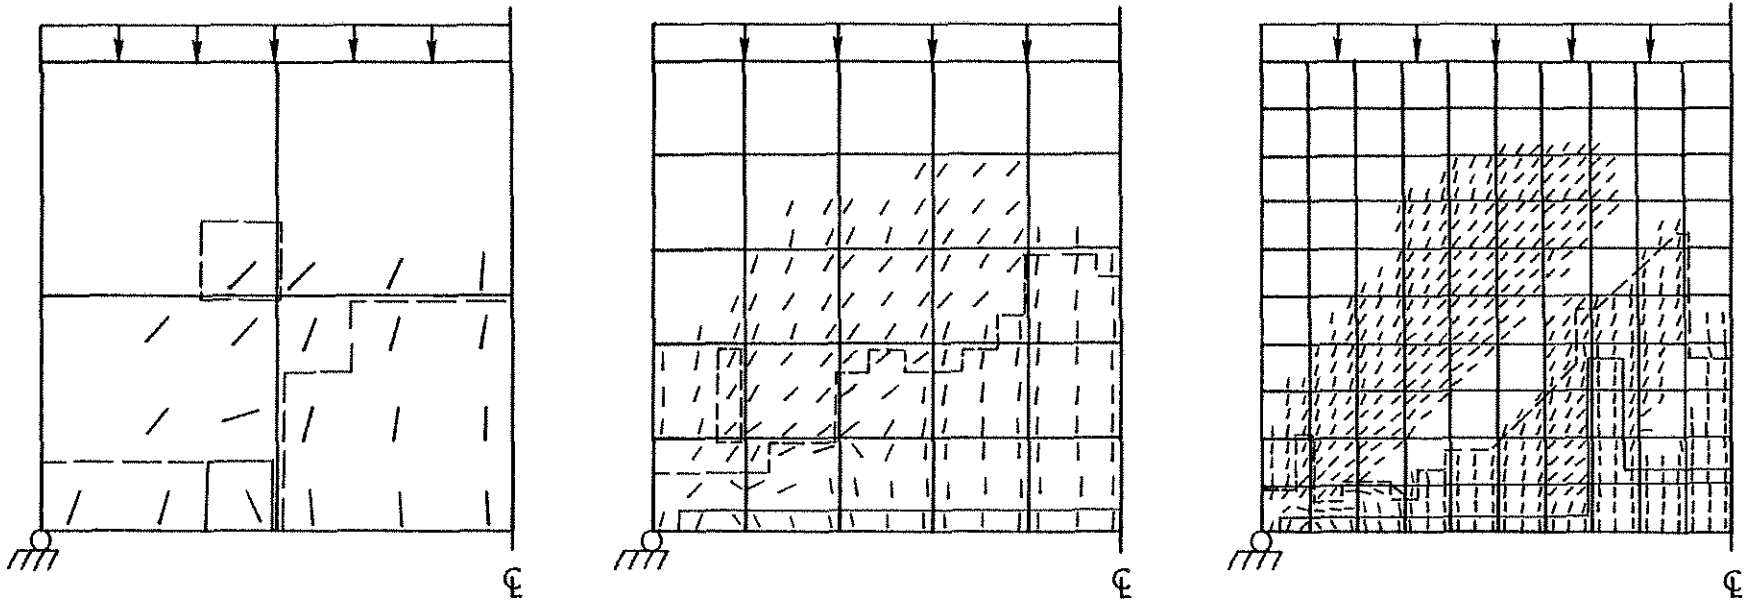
Crack Patterns for Deep Beam, Distributed Load, Linear Elements.
